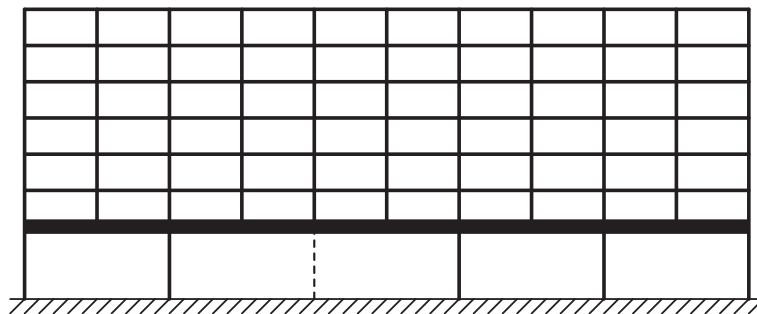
Reinforcing of transfer girders. From Kokot [3].
